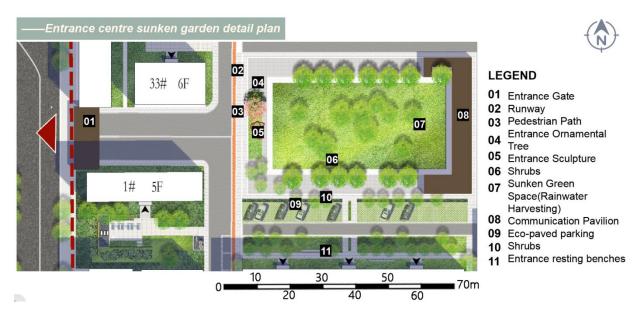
Entrance center-sunken garden detailed plan. Source: by author
